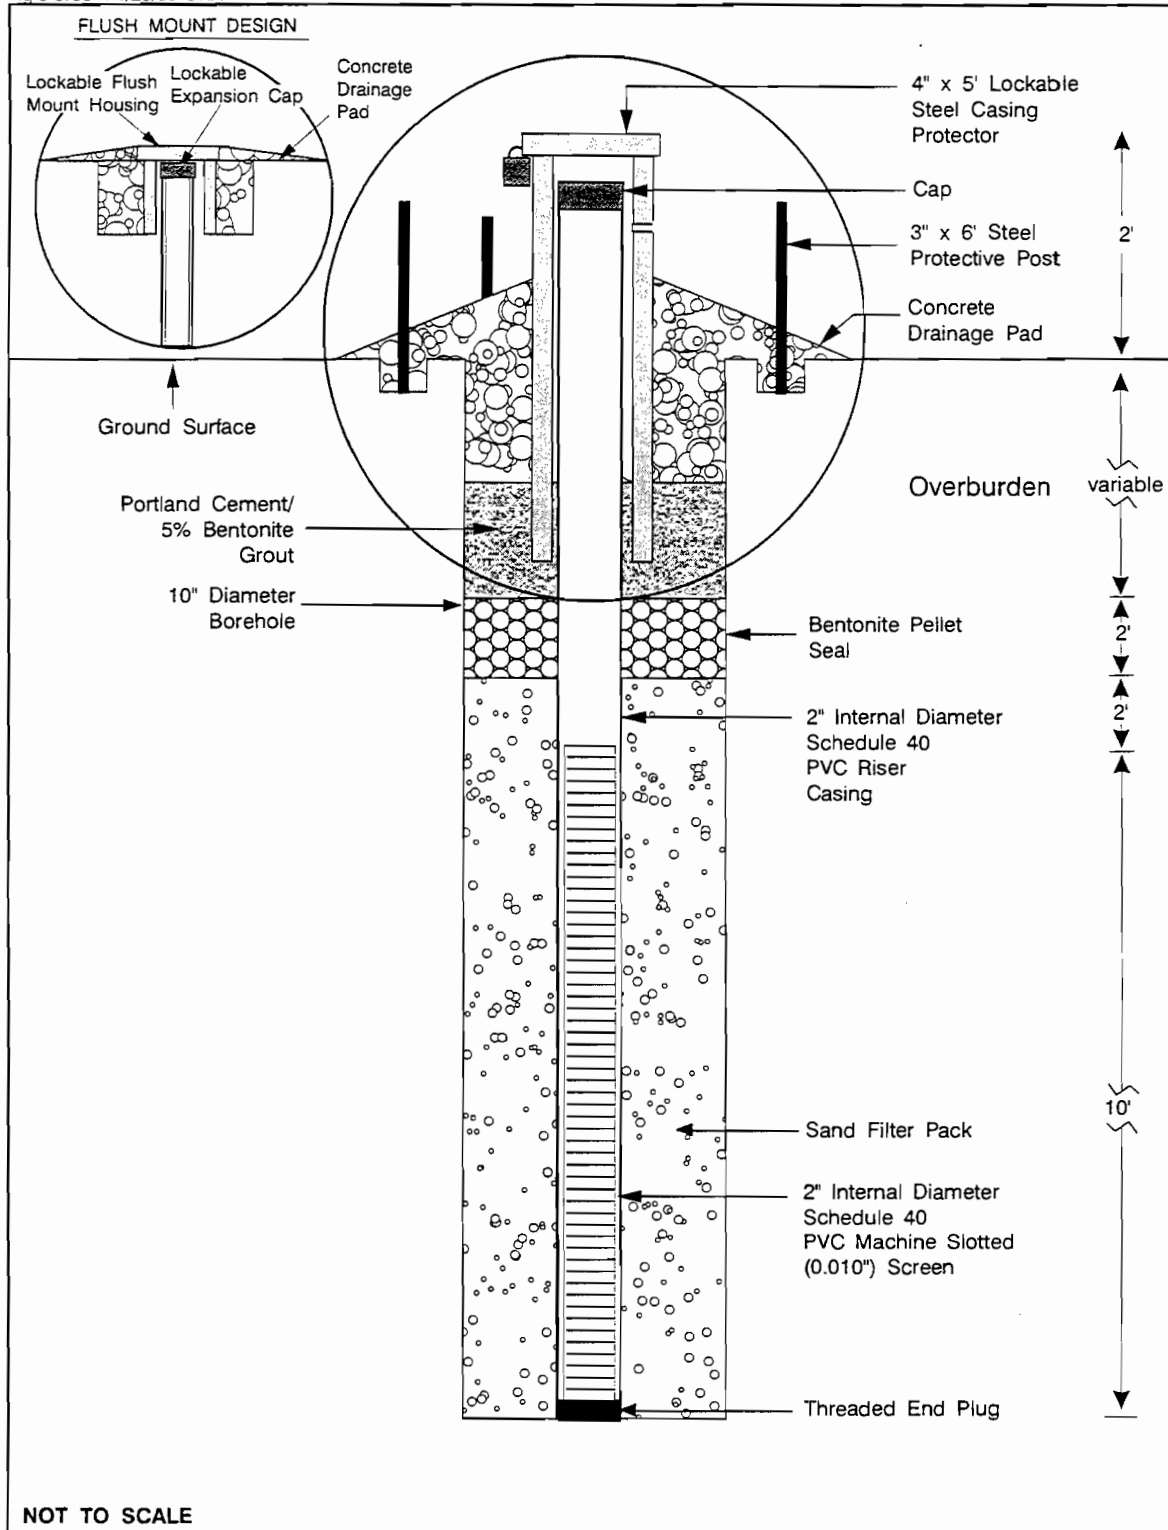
PROPOSED CONSTRUCTION FOR SHALLOW OVERBURDEN MONITORING WELLS
